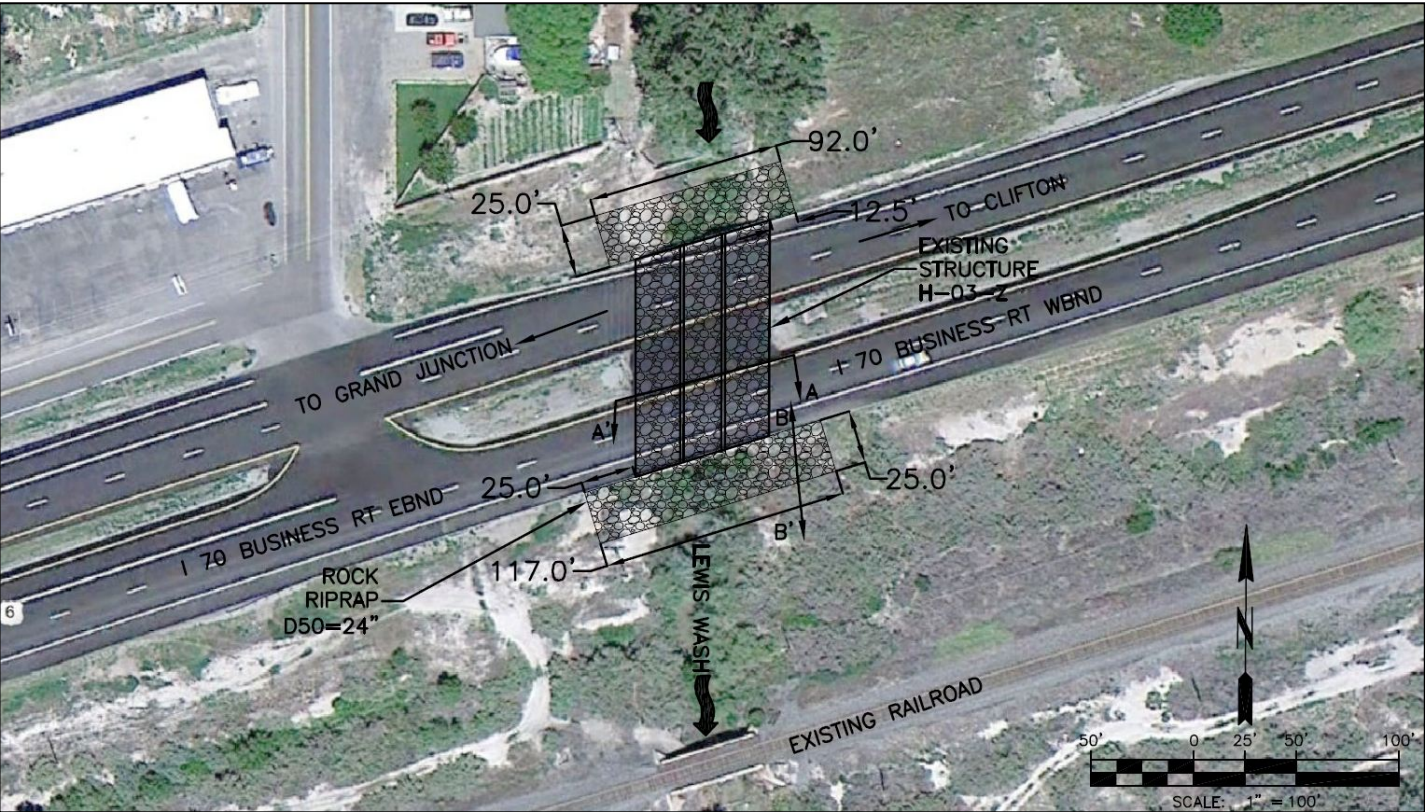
Plan view of Bridge H-03-Z with recommended hydraulic scour countermeasure locations
